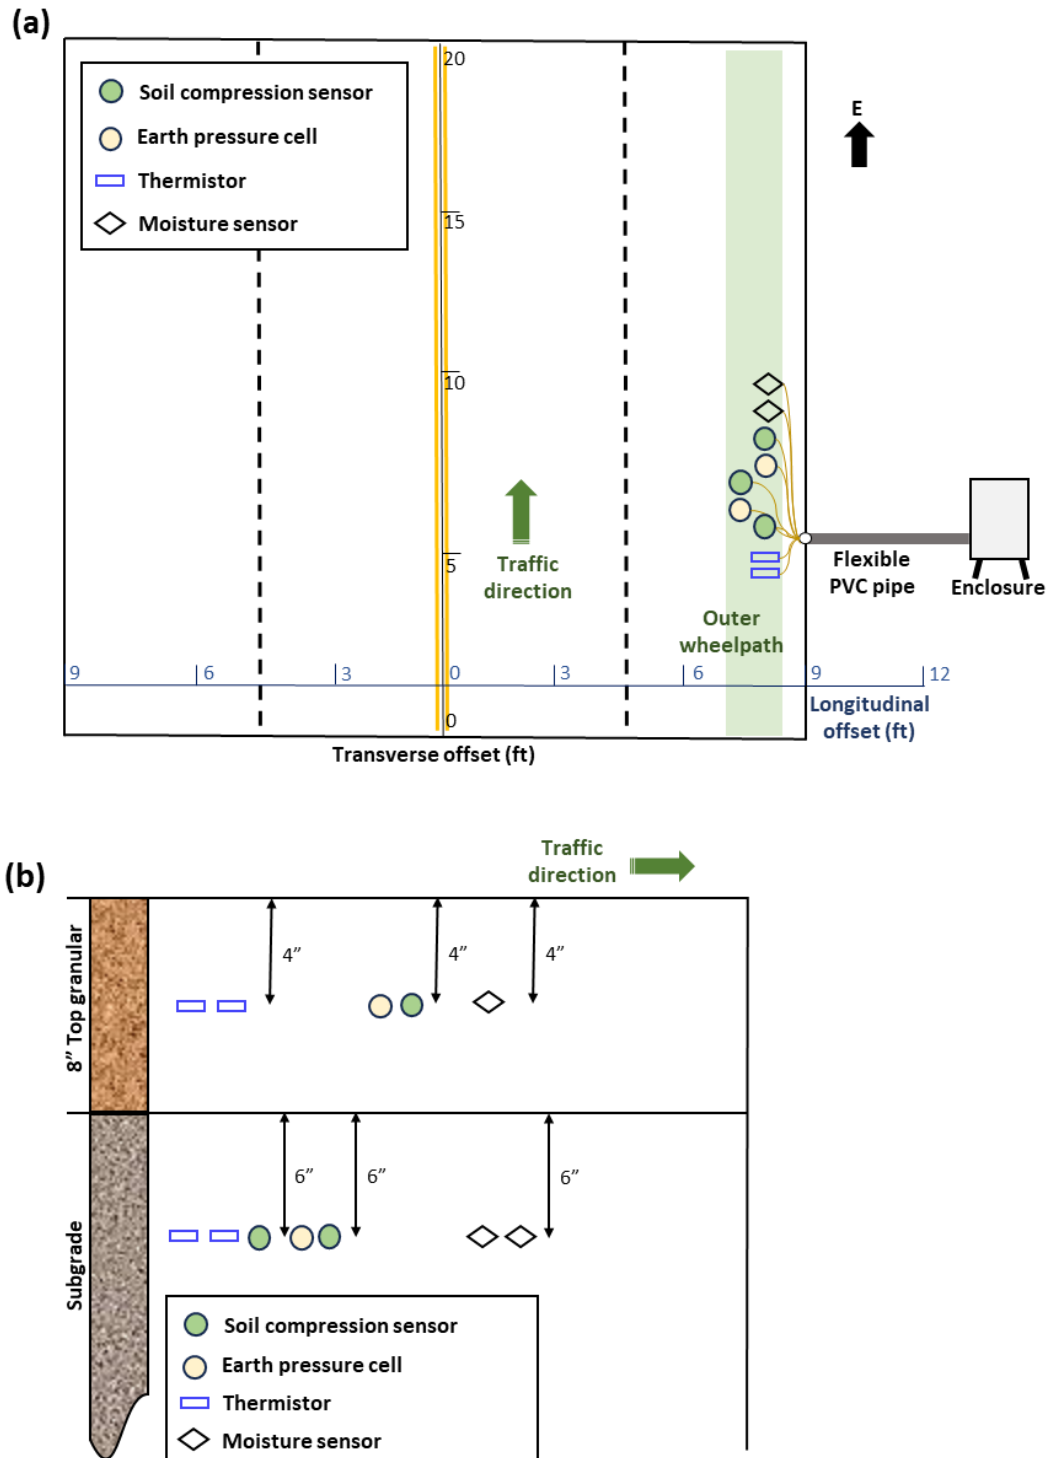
Sensor installation plan for granular road section: (a) plane view and (b) cross-sectional view
